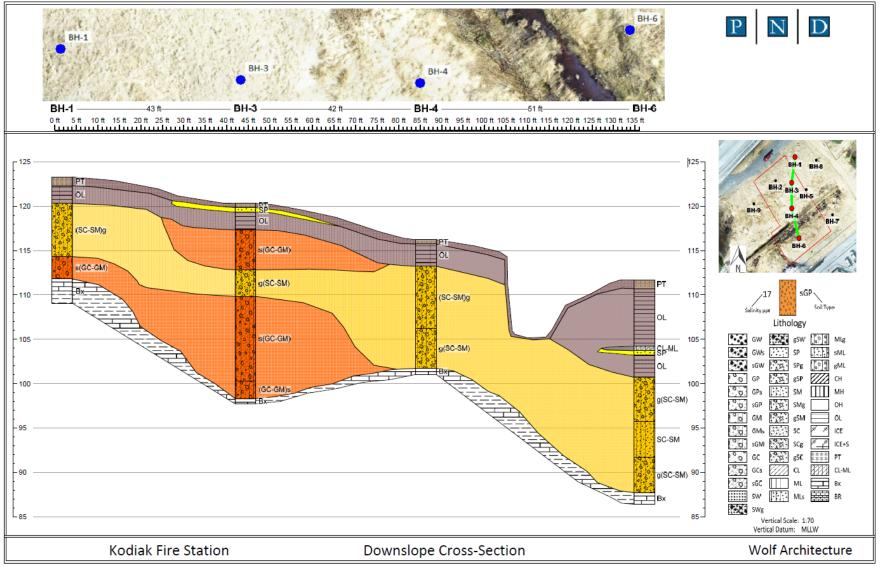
Cross-section of the downslope from BH-1 to BH-6 showing the trench where the abandoned retaining wall structure is at the project site.
